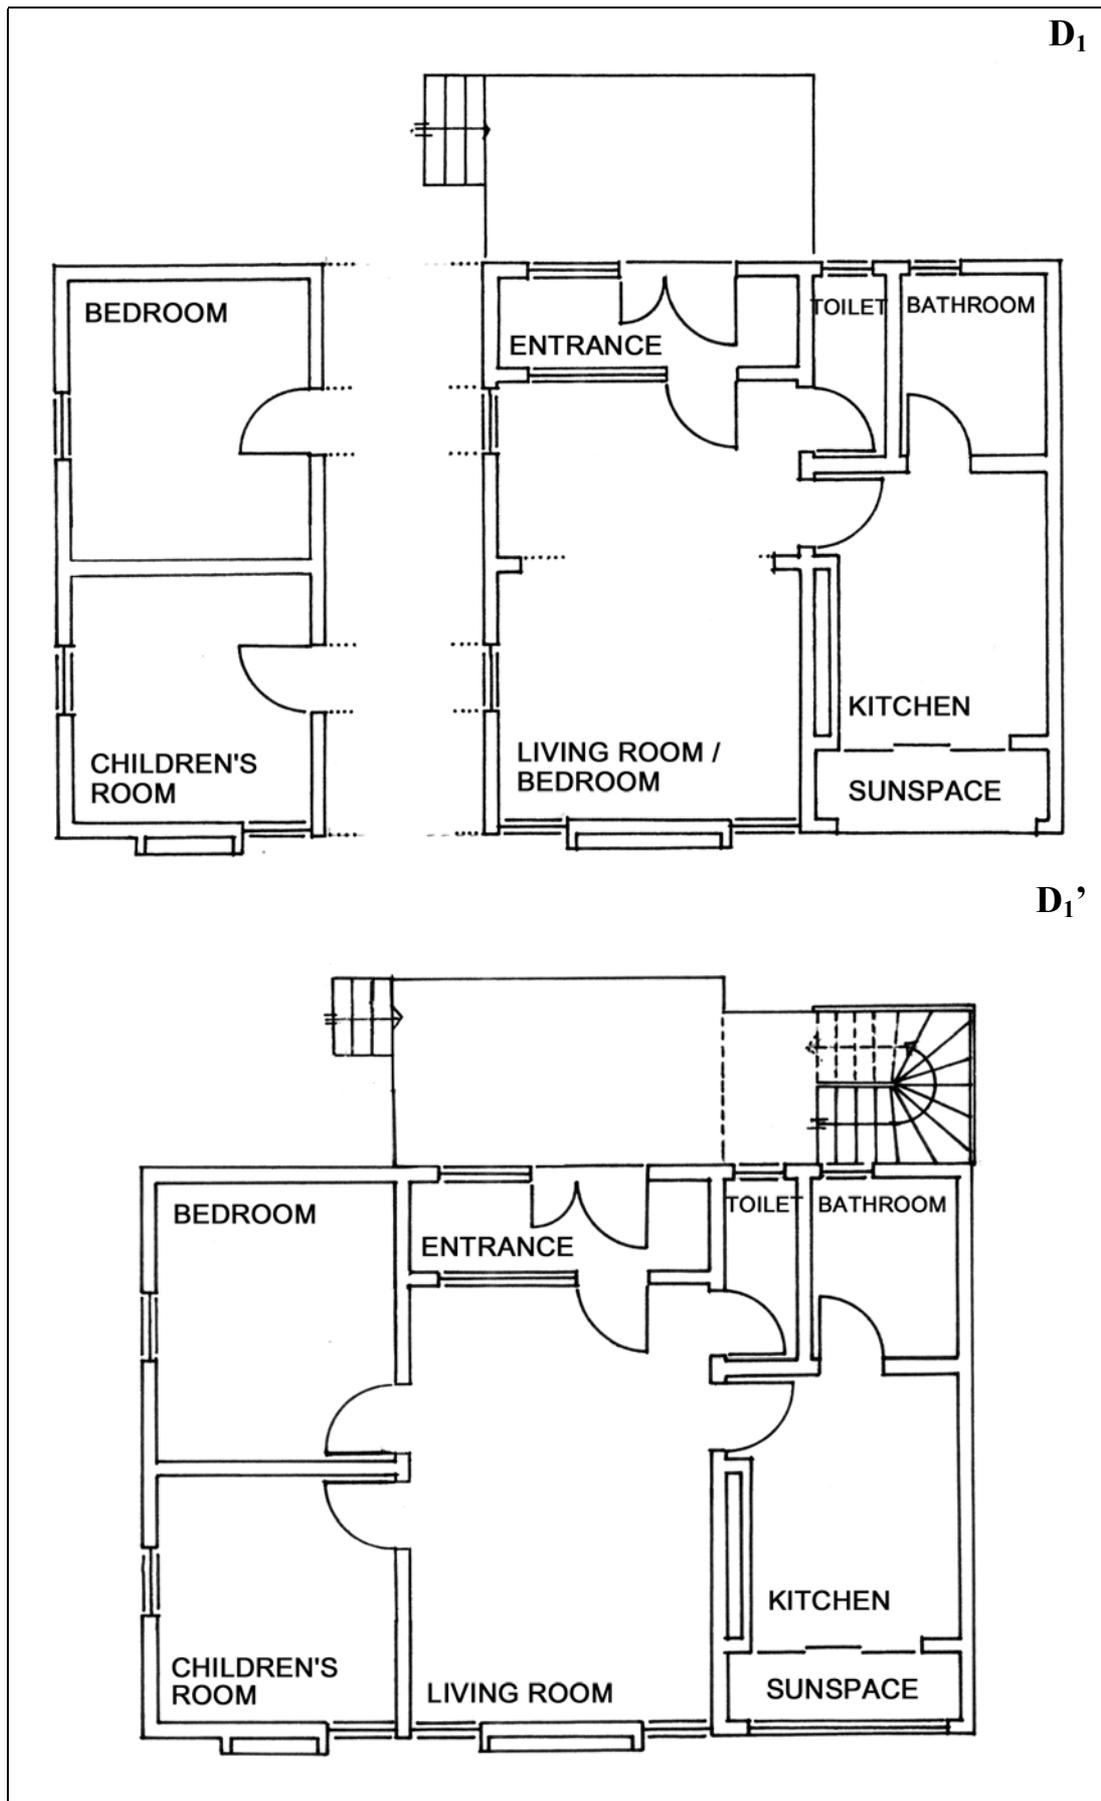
Plans of types D₁ and D₁' dwellings (house with northern entrance); Scale 1/100
